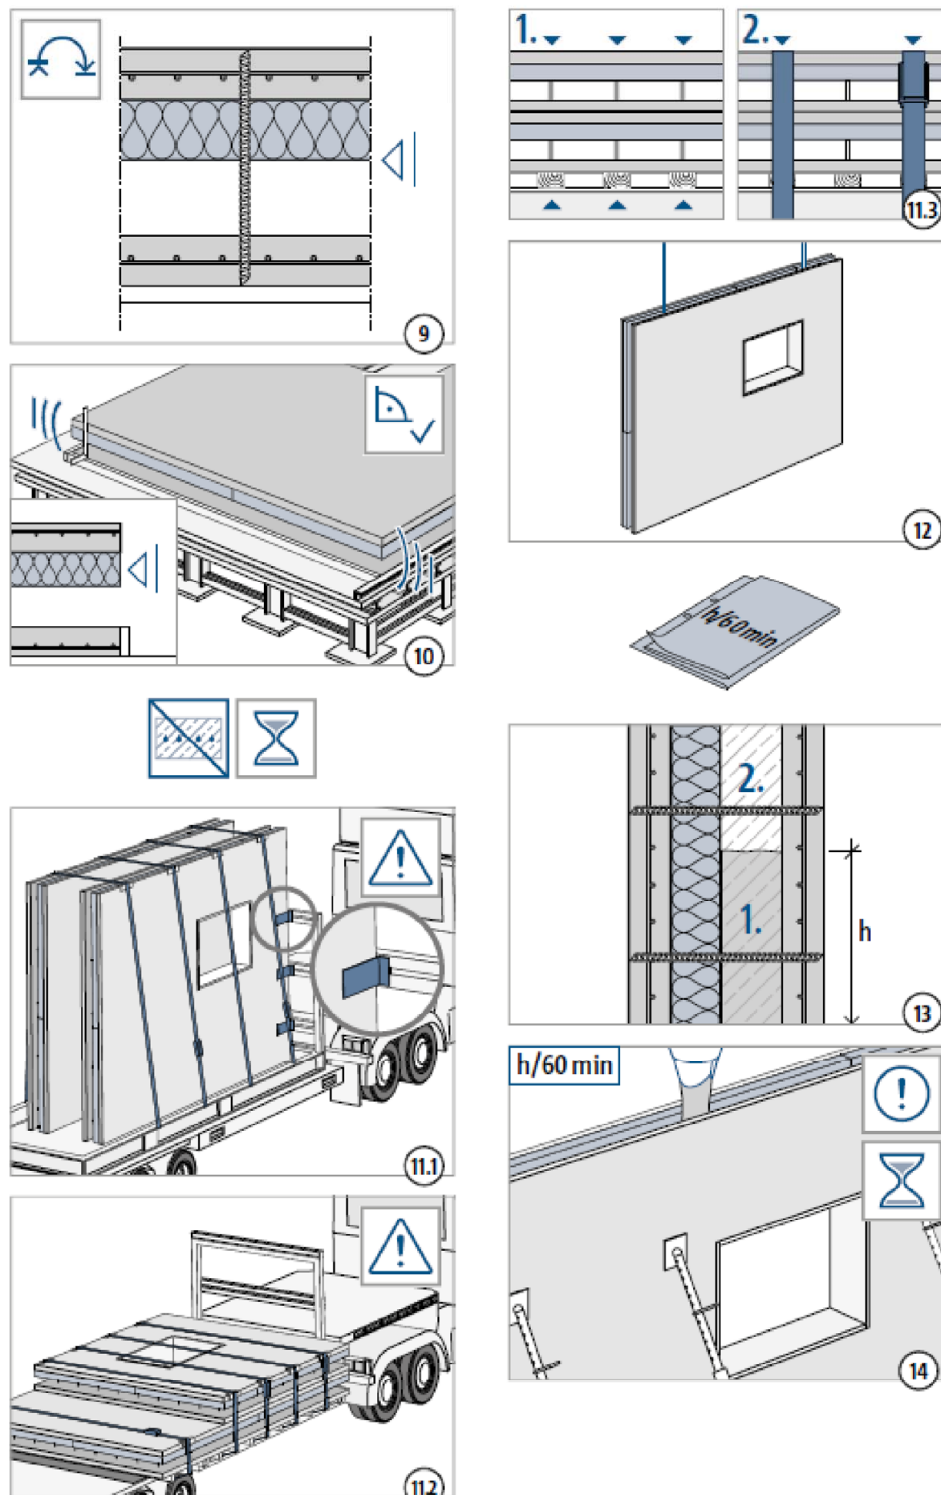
Installation instruction - Schöck Isolink® for element wall – page 2
